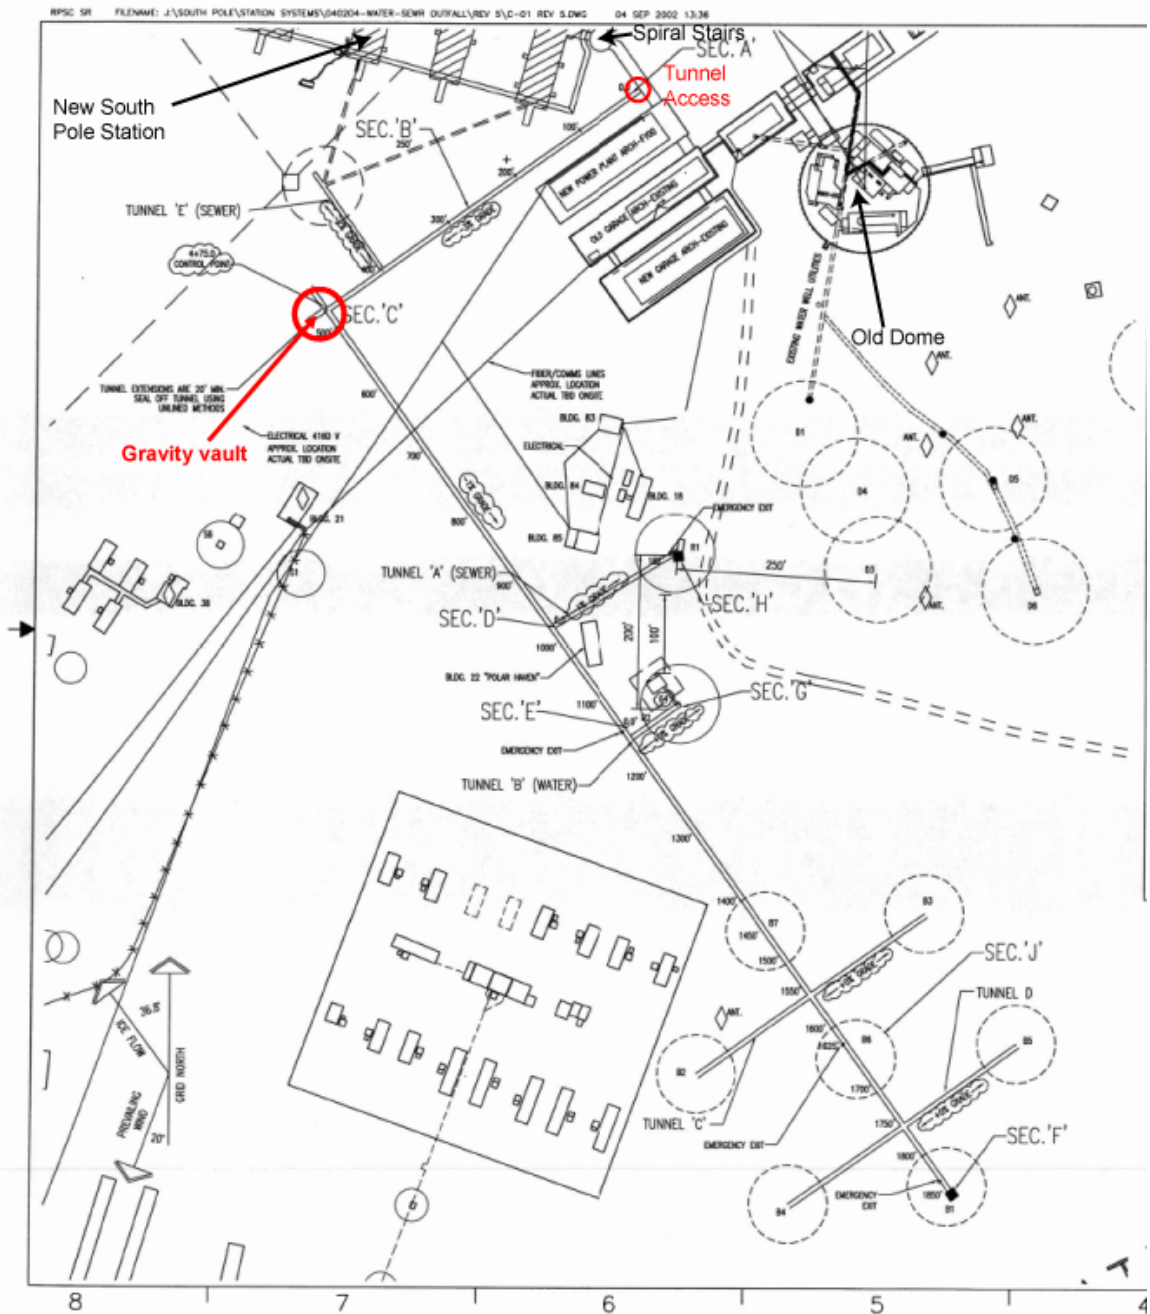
Raytheon Polar Services Sewer/Water Tunnel Plan at South Pole, sheet 2 of 25, drawn by C. Rock on 09/15/98. Labels added for the current location of the new gravity vault, old dome, new station, and spiral stairs (modified, image courtesy of P. Sullivan, pers. comm., 2008).
